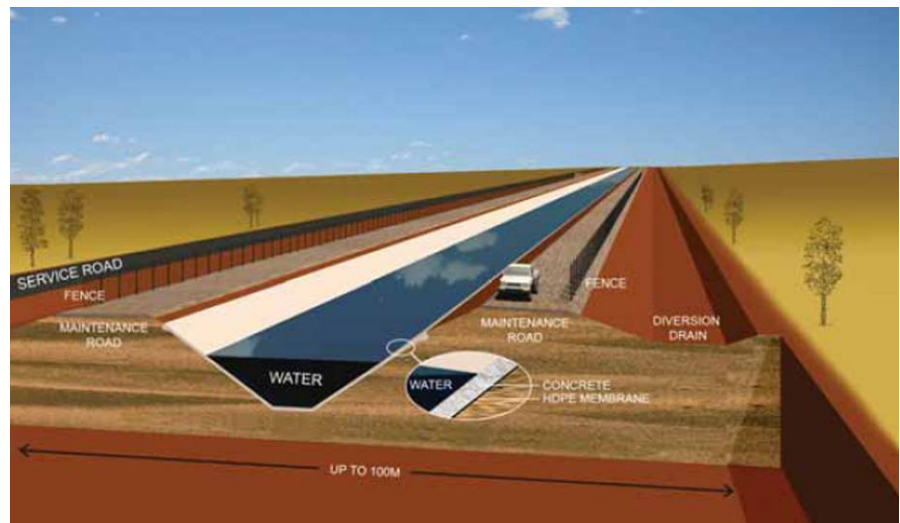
Diagrammatic Cross Section of the Proposed Canal
